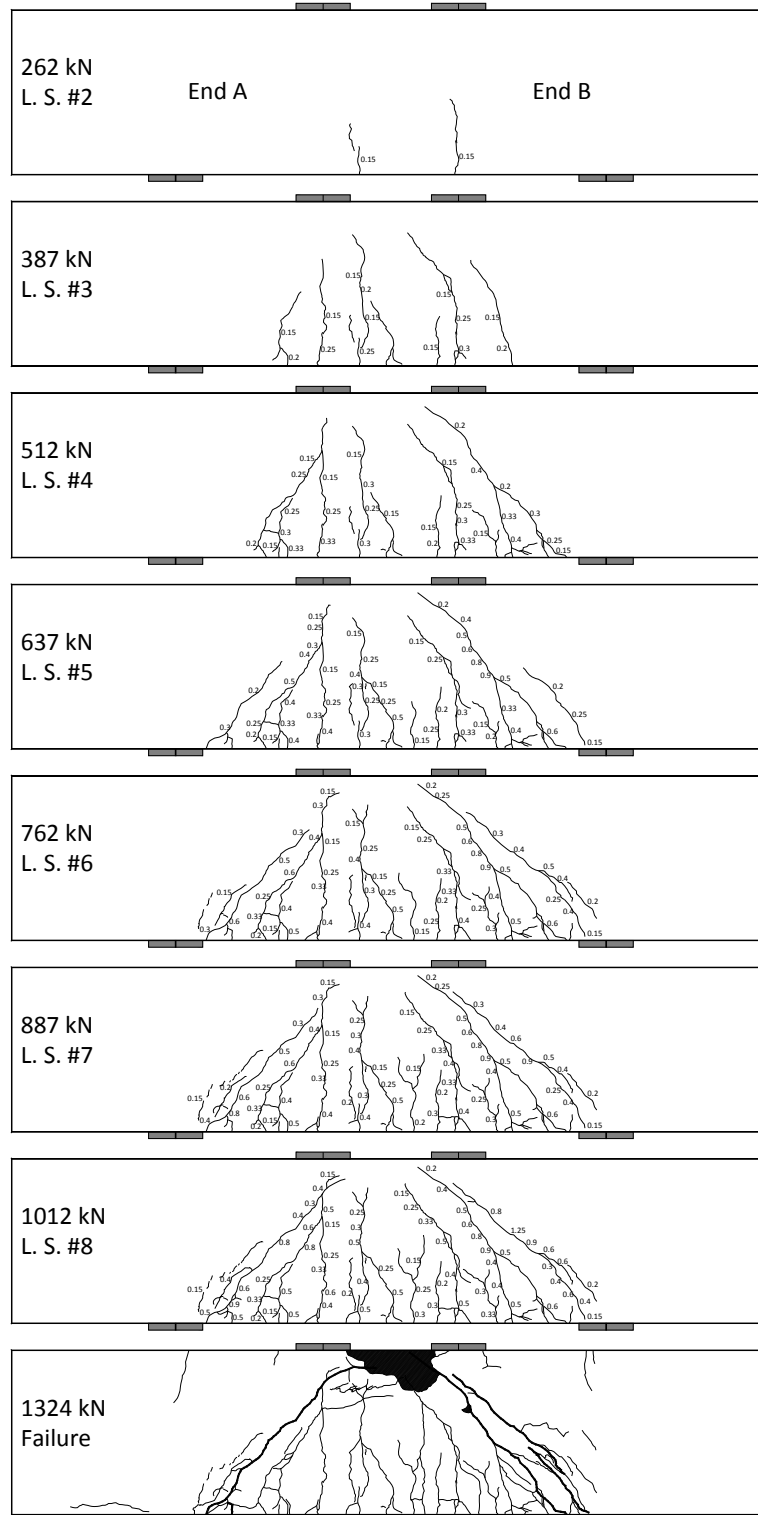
Crack diagrams of specimen B1N showing the development of the cracks and the widths as loading progressed.
